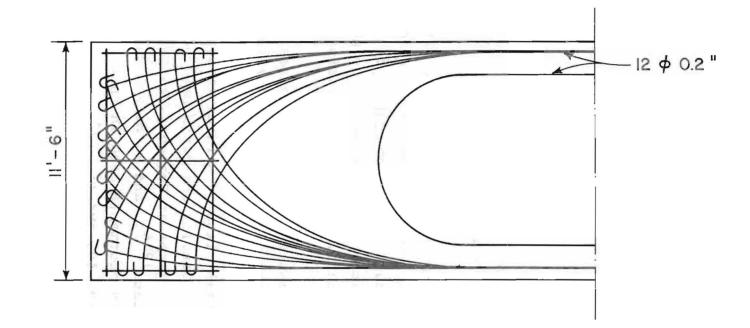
ARRANGEMENT OF TENDONS IN PRESTRESSED PAVEMENT AT WEXHAM SPRINGS, ENGLAND
